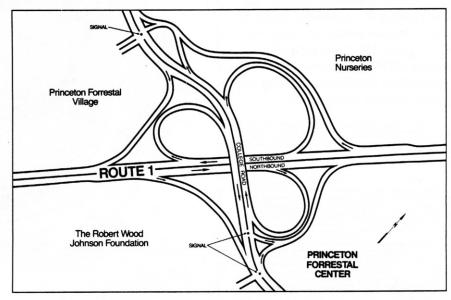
Schematic of how the College Road Overpass will look when completed.
